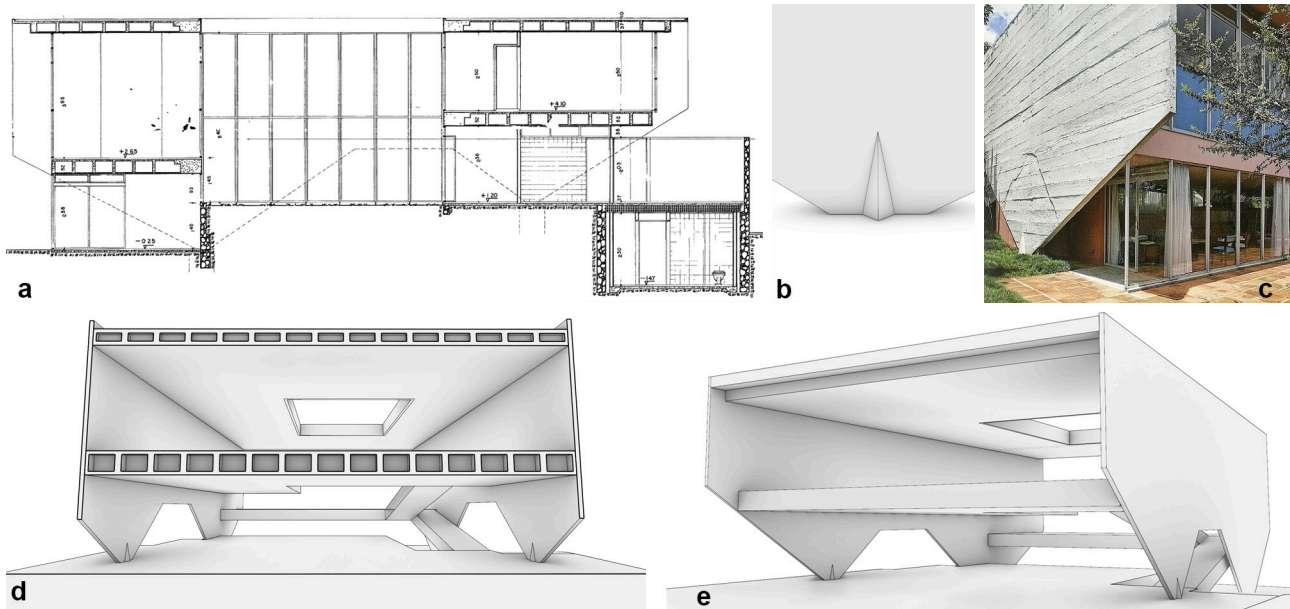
a. Original drawing of vertical section (source: Acervos da FAUUSP); b. detail of the pyramidal support in a portico (elaboration by the authors); c. photo (source: Acervos da FAUUSP); d., e. 3D structural model (elaboration by the authors).
